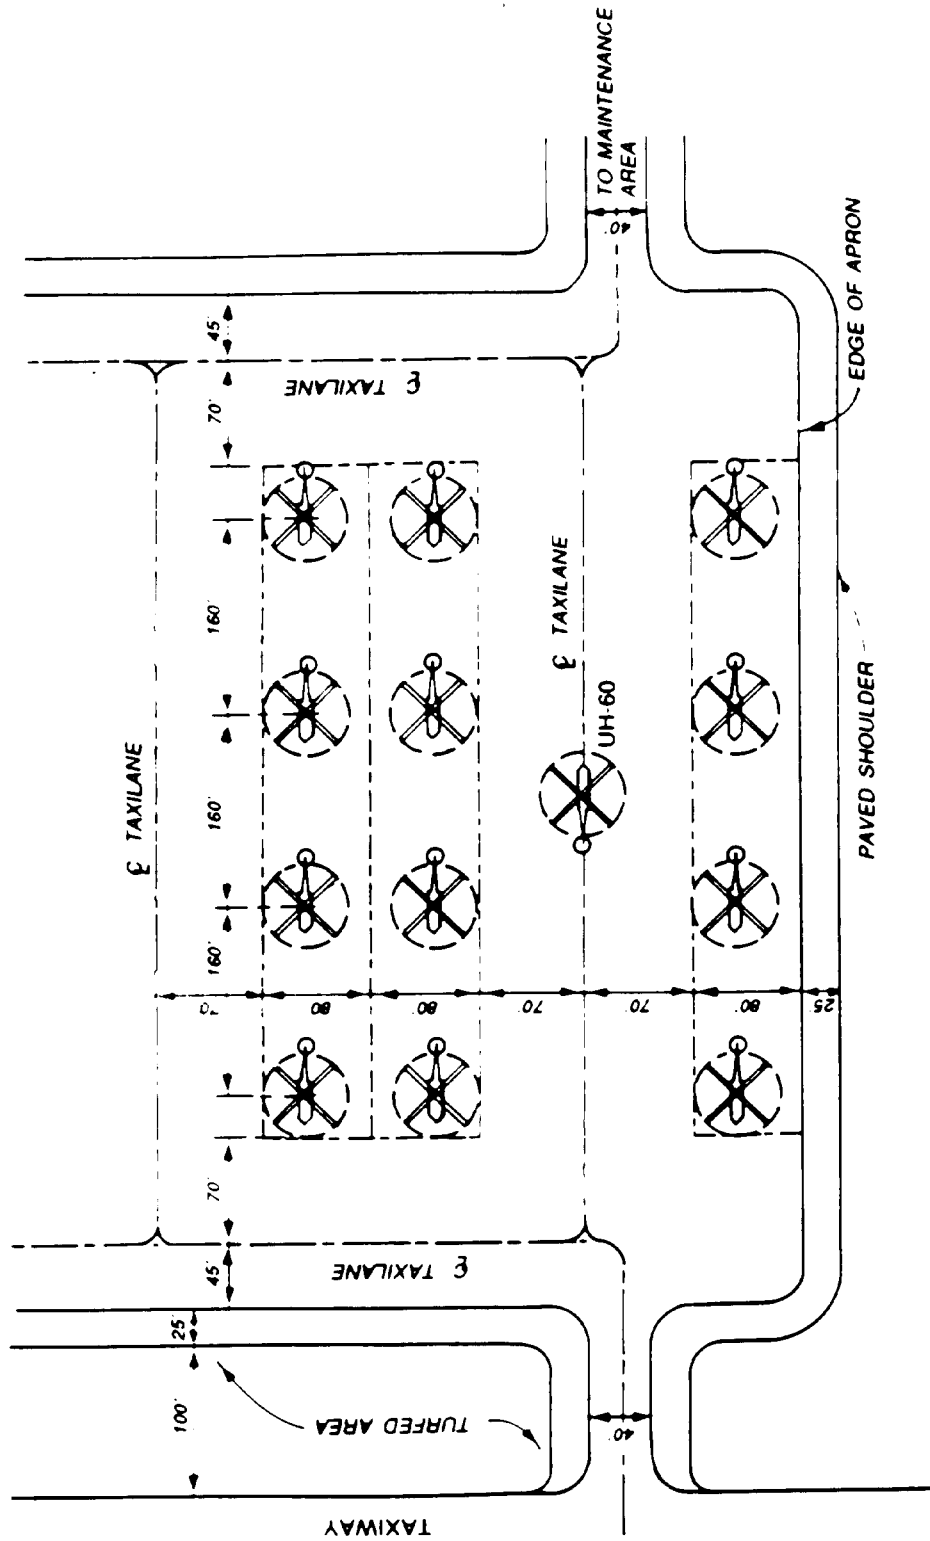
UH-60 Parking Plan, Type 2 (Double Parallel)
